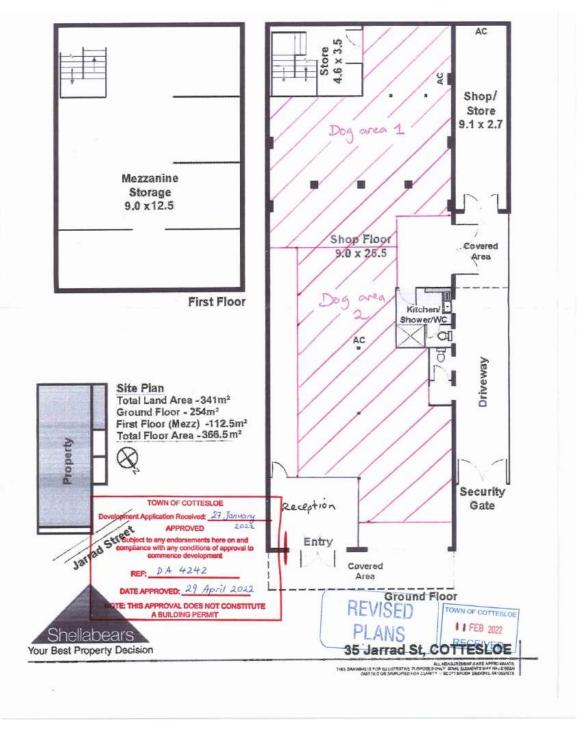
Floor Plan (NTS) (Source: The Canine Lounge)
